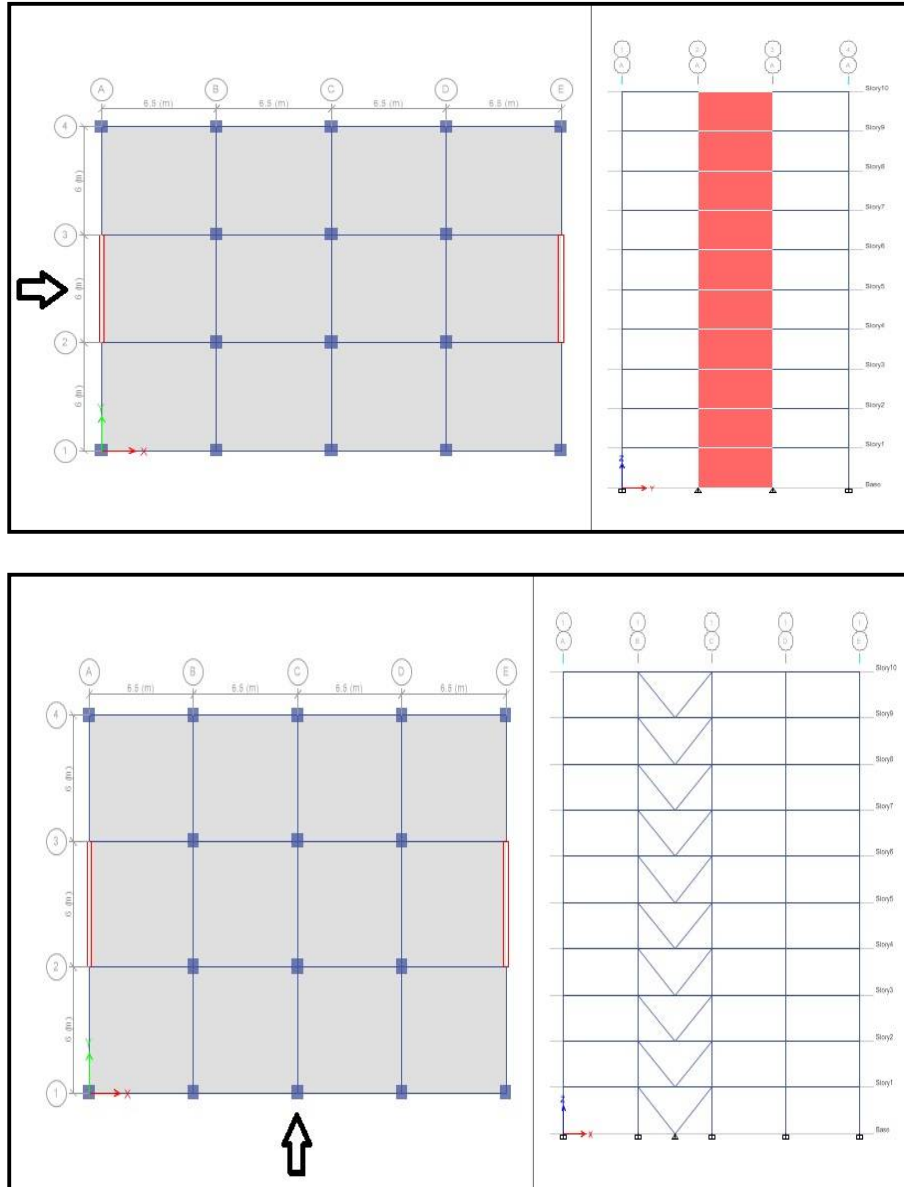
Typical Plan and Elevation of the Building with Shear wall and Bracing
